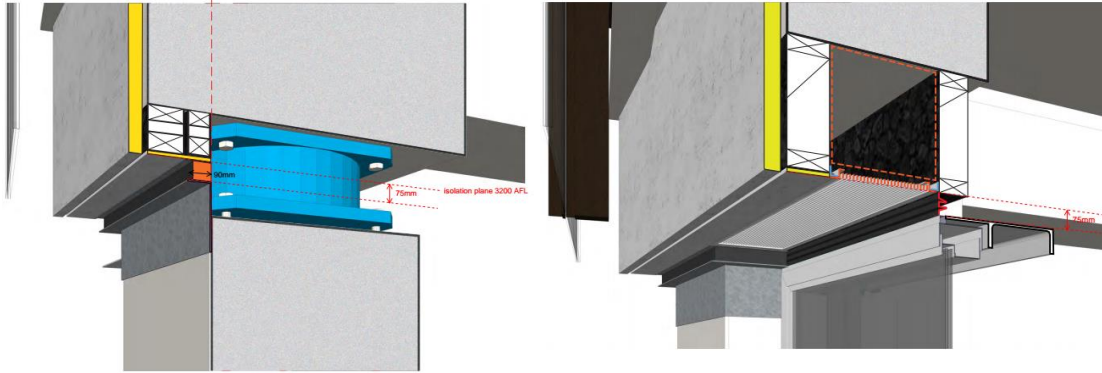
Schematic architectural solution at the perimeter of the building. Weather protection and installation of mechanical ventilation plenum.
